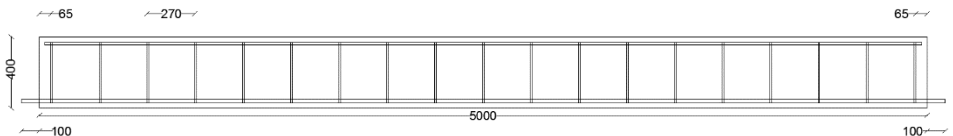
Longitudinal section of the beams (dimensions in mm)
